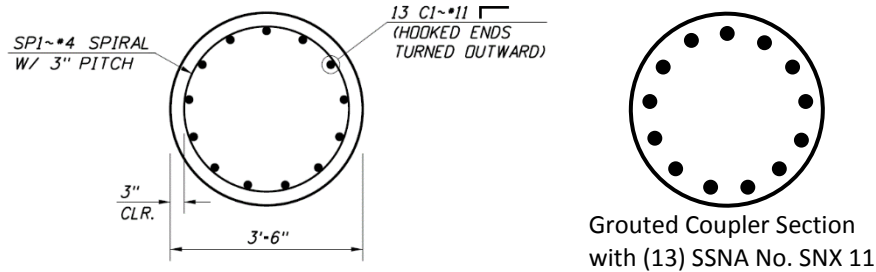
Dubois Bridge Column Steel and Grouted Coupler Sections (NTS)
